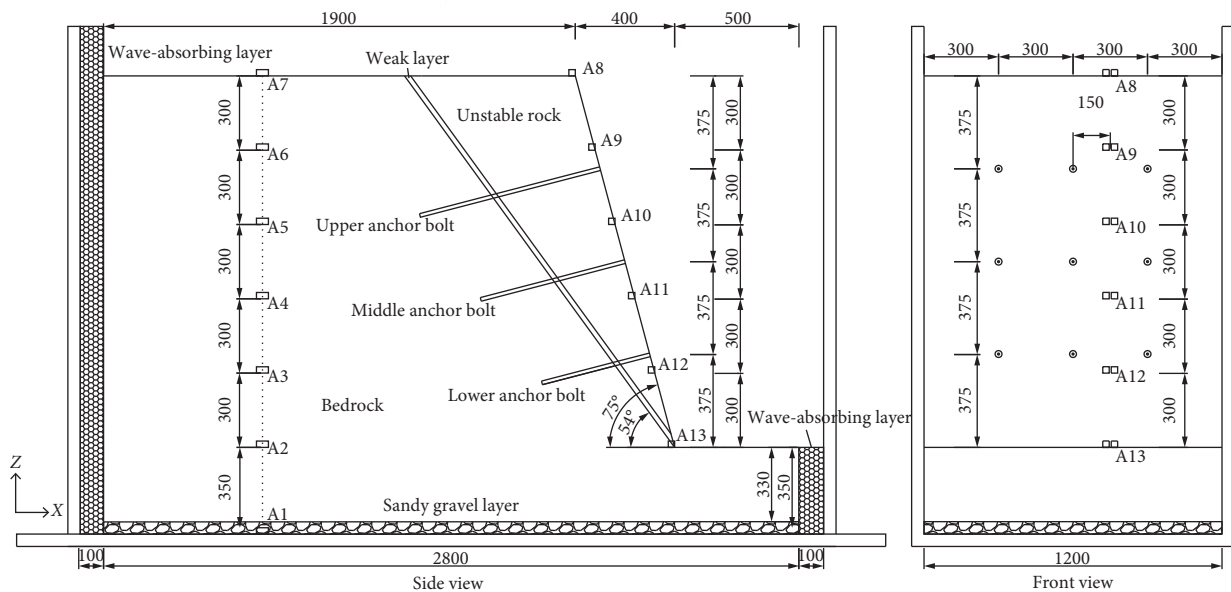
Model size and layout of monitoring points (unit: mm).
